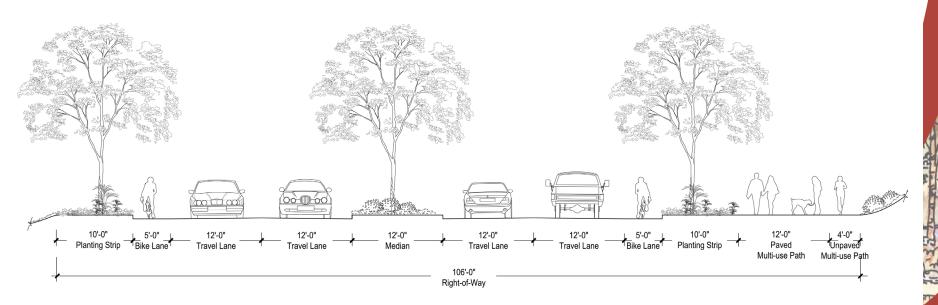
A Street between D Street and Rancho del Oro Drive and B Street
